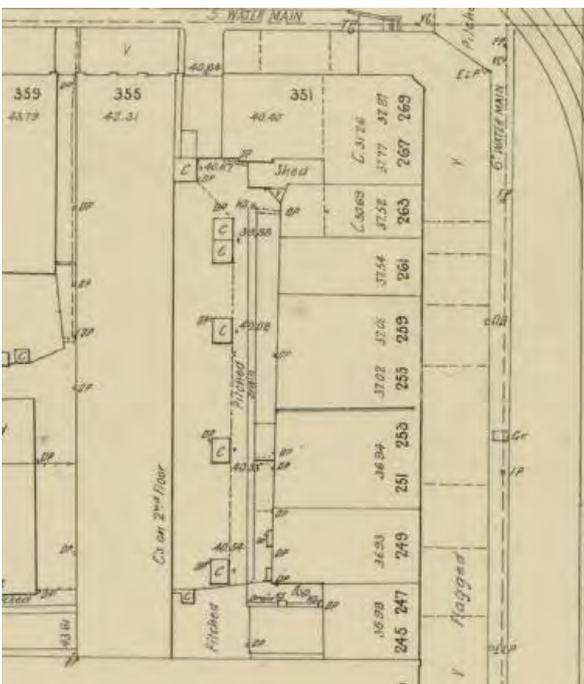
Detail of MMBW plan no. 1016, 1894 prior to the construction of the current row of three-storey buildings along Elizabeth Street
